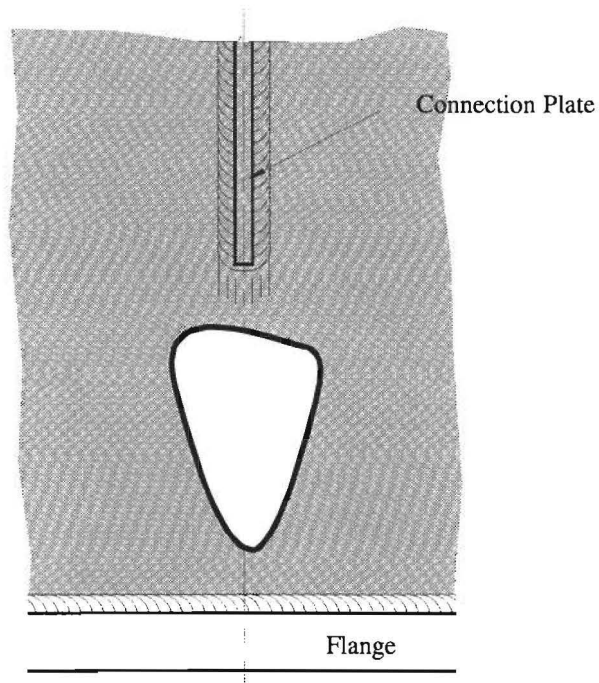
Example of undesirable curvature near web-to-flange weld.
